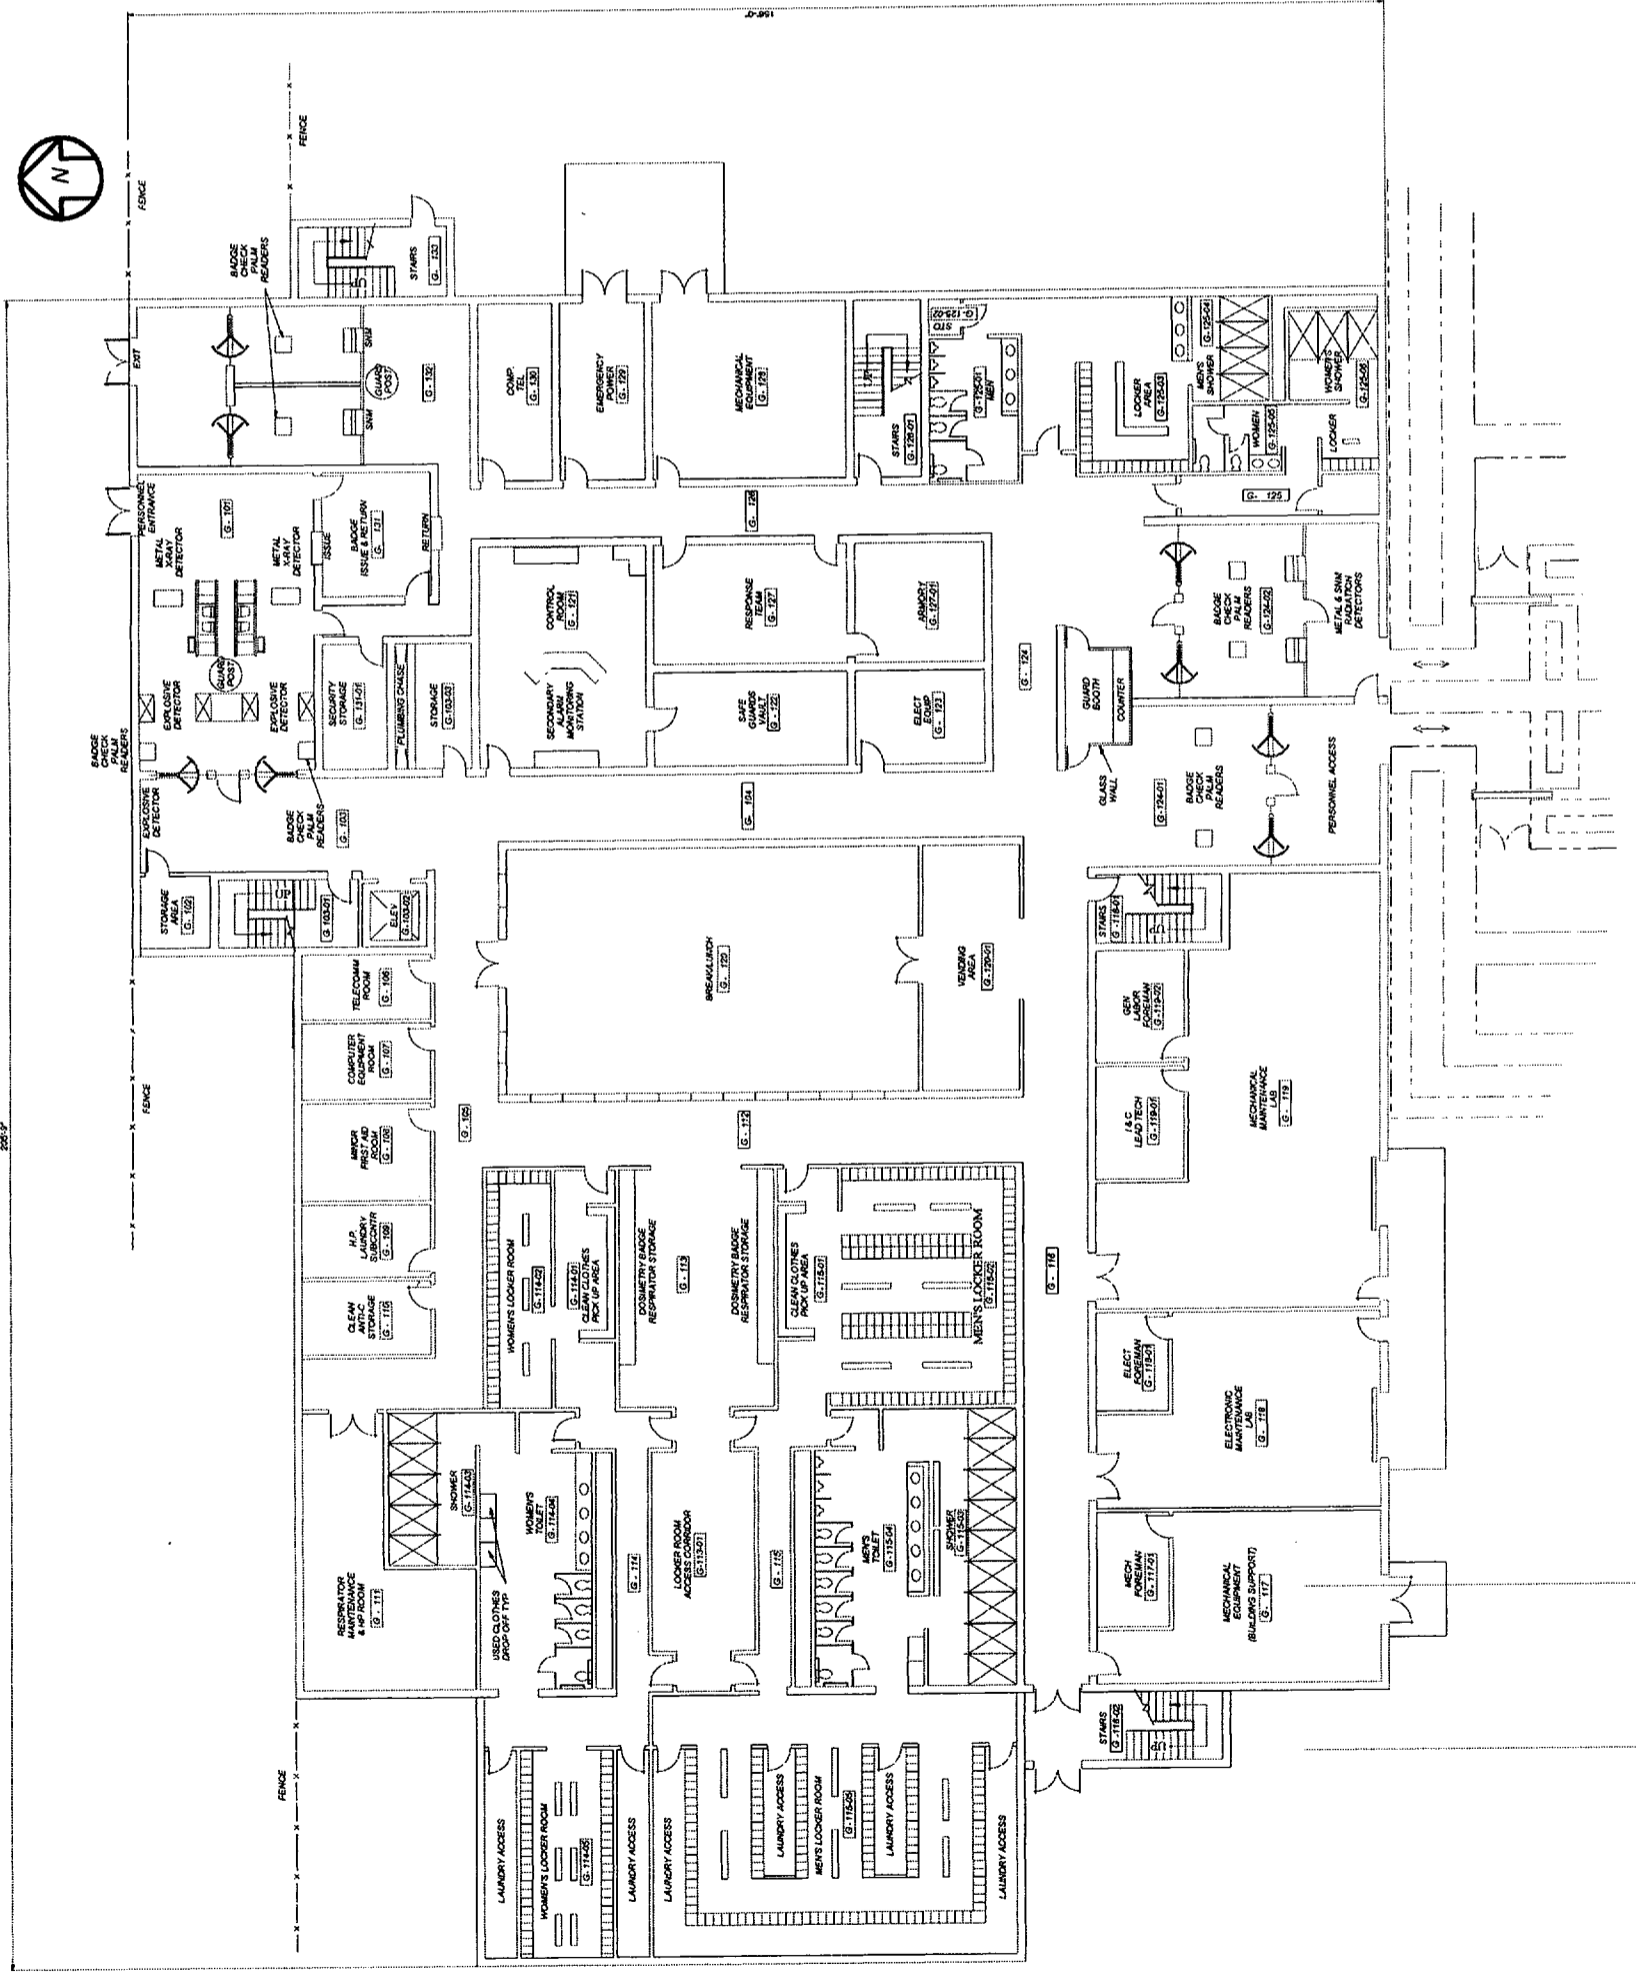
General Arrangement Secure Warehouse (BSW) - Conceptual Layout
